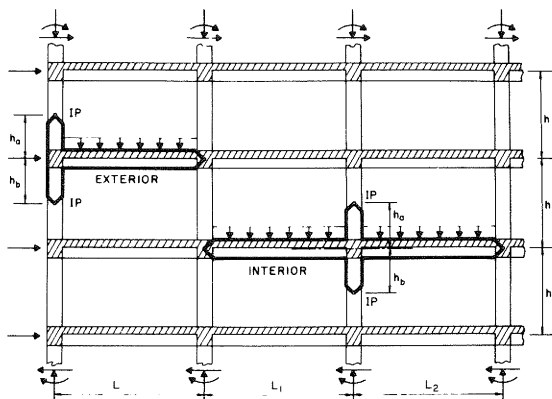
BEAM-COLUMN SUBASSEMBLAGES
